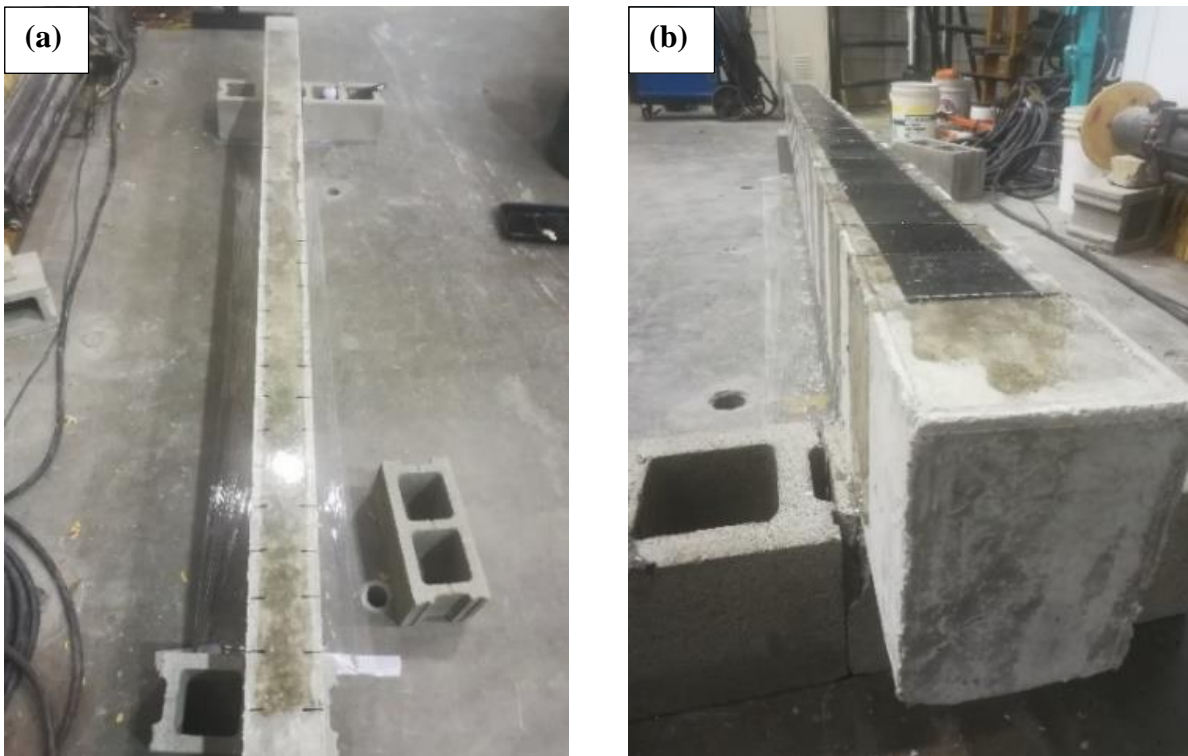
(a) Applying epoxy to the concrete surface, (b) Placing FRP sheet to the concrete and applying epoxy to sheet surface.
